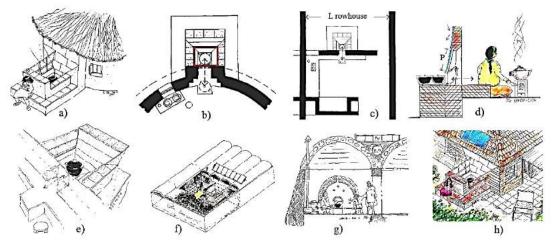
Thru-reflector-wall (TRW) Small House Types a-b) small house with circular plan; c) TRW added to small row-house partial plan [71]; d-e) drawings with cook-pot funnel-box and low countertop; f-g) house with roof vaults; h) small house with tile roof.
